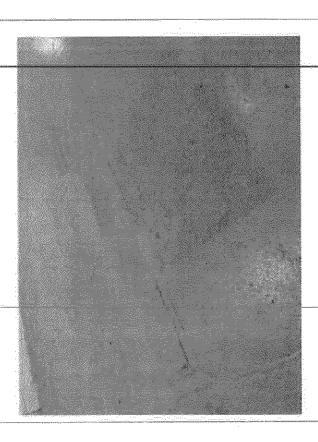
View showing localised pitting of concrete floor slab at front left corner of unit. View along left flank party wall showing variance in floor slab level from front to rear. Photograph 85
